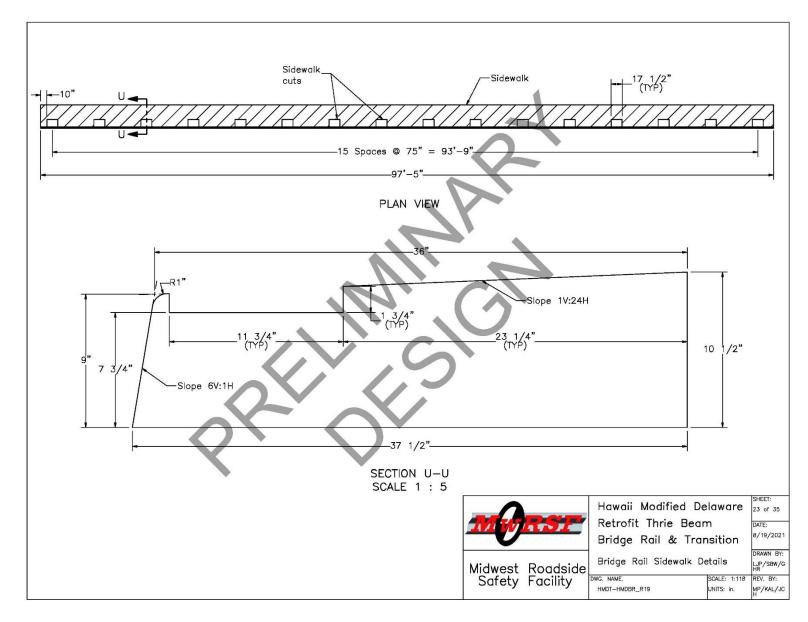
Bridge Rail Sidewalk Details, Test No. HMDT-1
